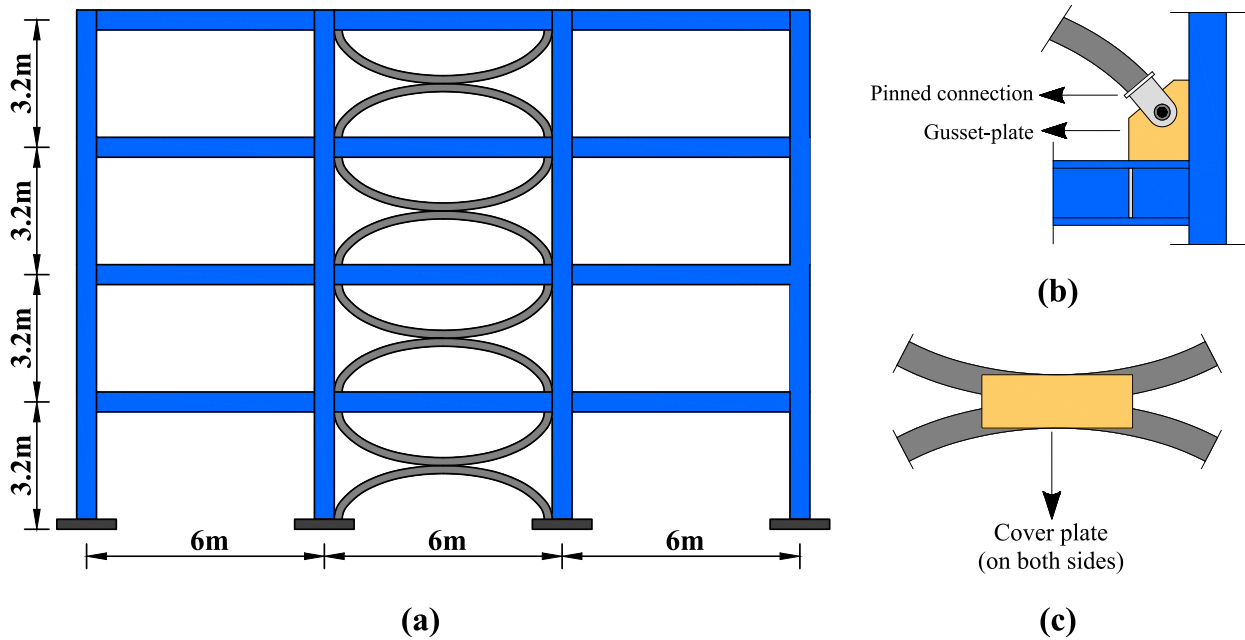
Quasi inverse-X-braced steel moment frame (QIXB-MF); (a) Elevation view, (b) Corner-connection details, (c) Mid-connection details.
